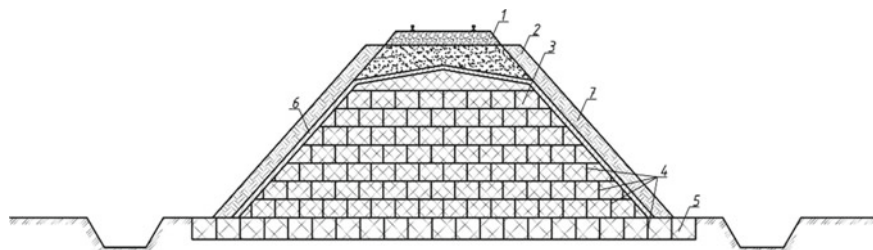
Example of an embankment structure on a weak base for a railway track: (1) ballast layer of crushed stone; (2) sand drainage layer; (3) monolithic polymer-cement foam concrete D900; (4) spatial polymer lattice; (5) foam concrete D500; (6) waterproofing polymer layer; (7) ground dusting
